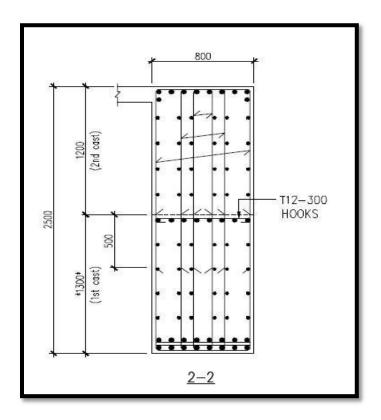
One of type transfer beam detail structural drawing used in this project.
